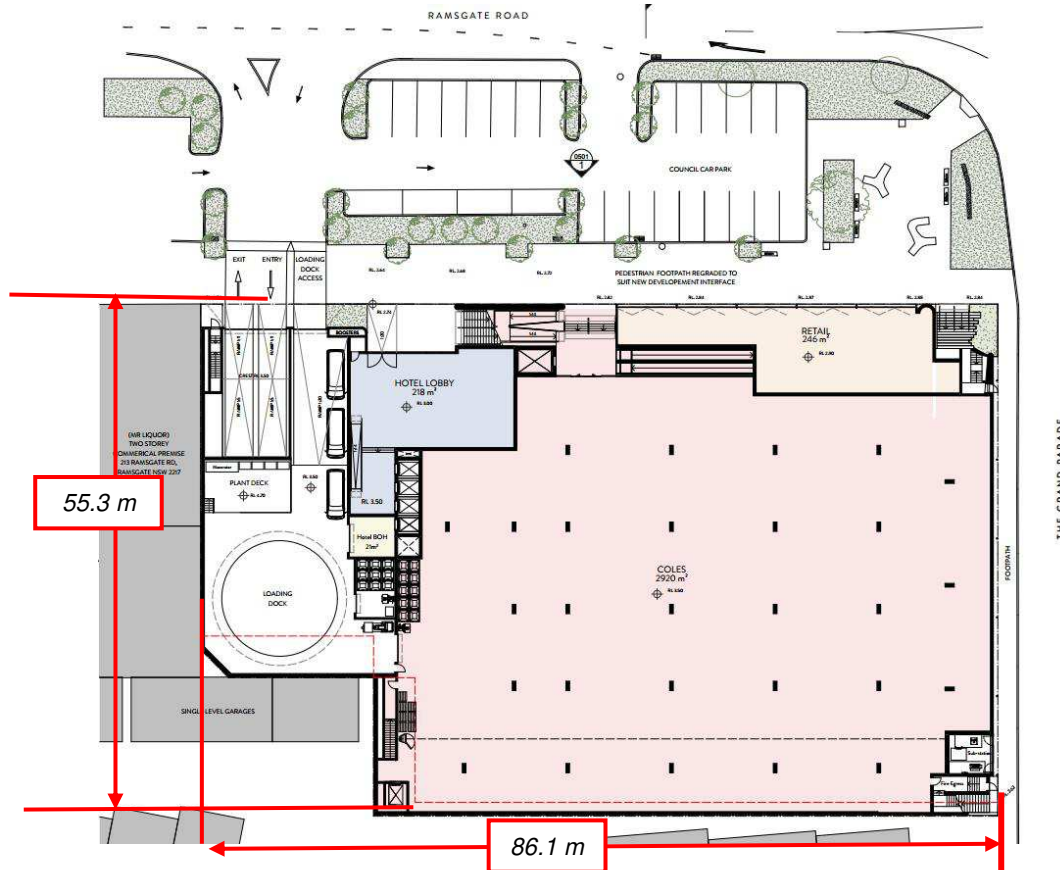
Ground floor plans with the plan-form dimensions overlaid.
